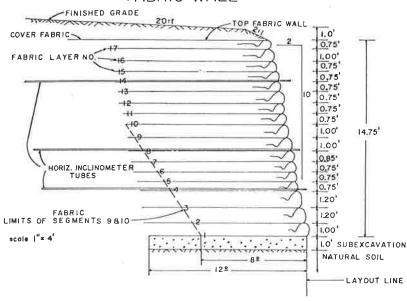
Geotextile wall elevation with test segments and fabric types indicated.
